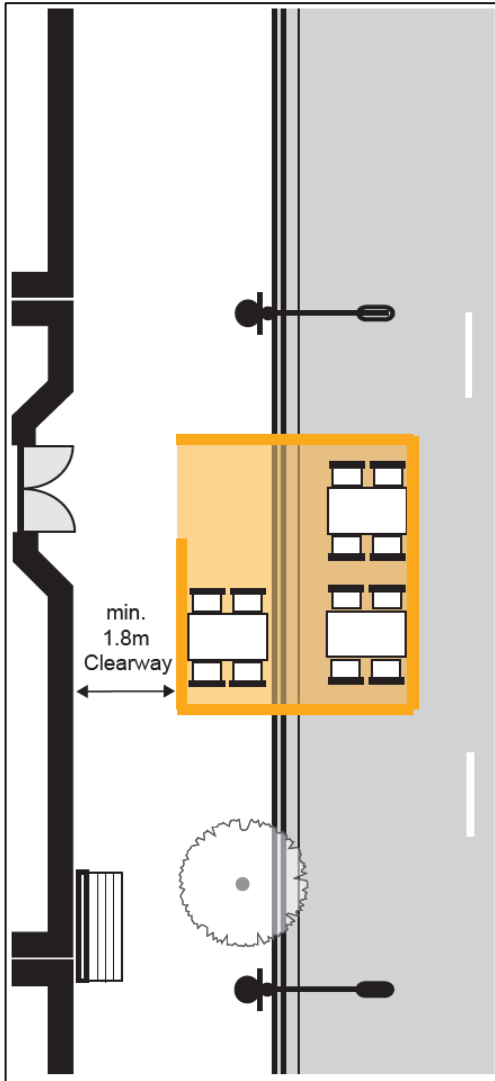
Boulevard and On-Street Combination<sup>6</sup>
